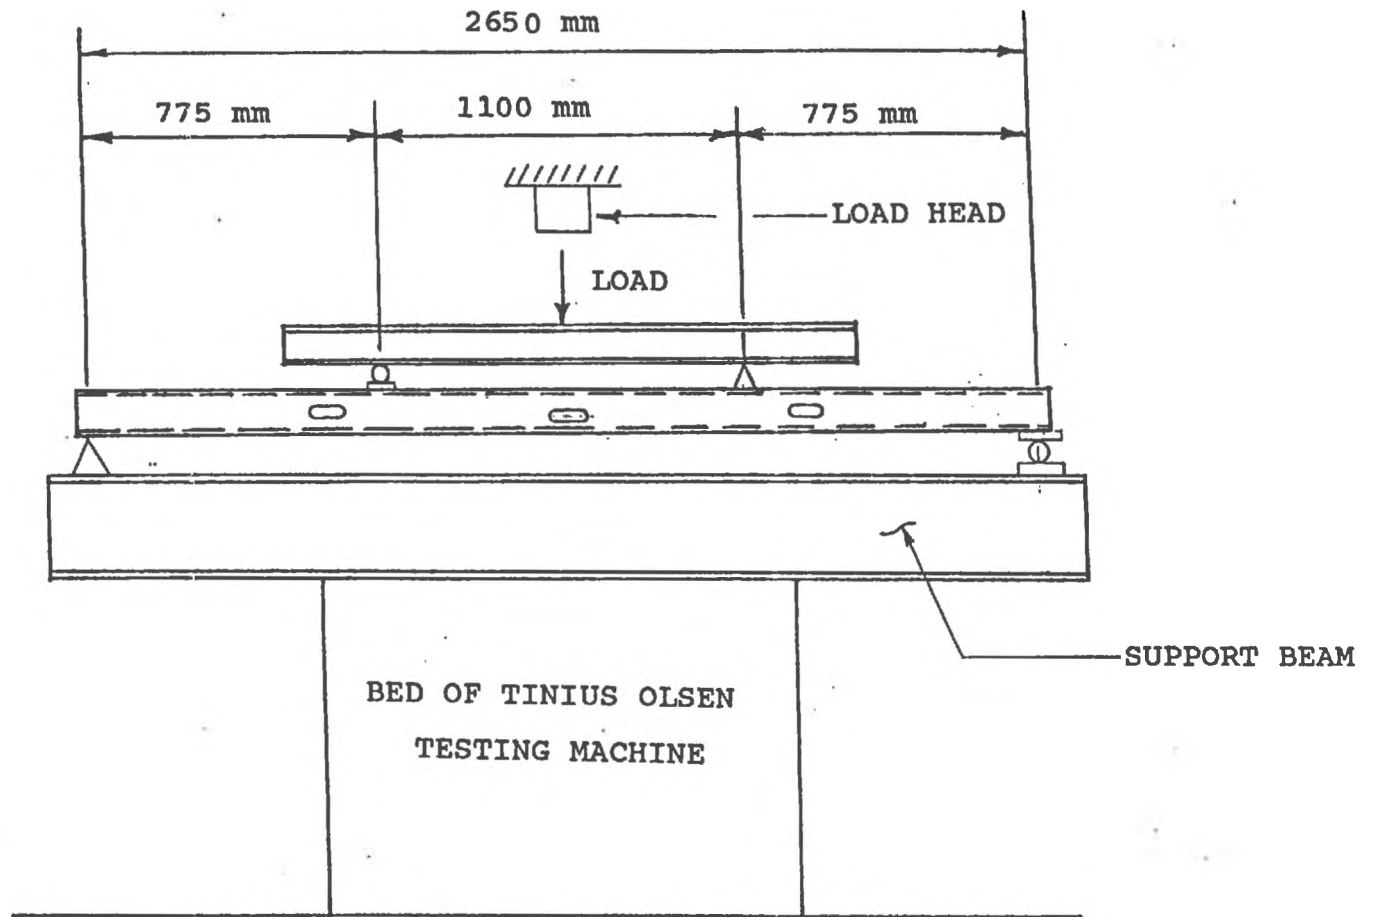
Test Setup for Beam Test Specimens - Series 6B
